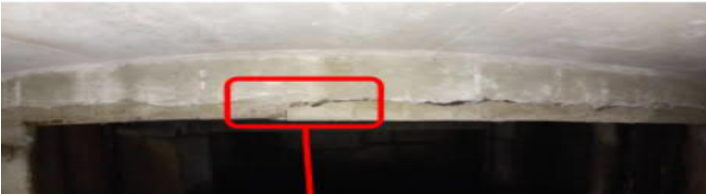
Unit 4 South Sump Crack in West Beam
